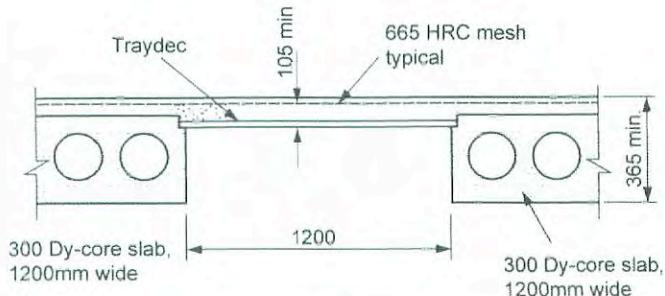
Steel profiled decking mixed with tertiary precast beam and slab.
